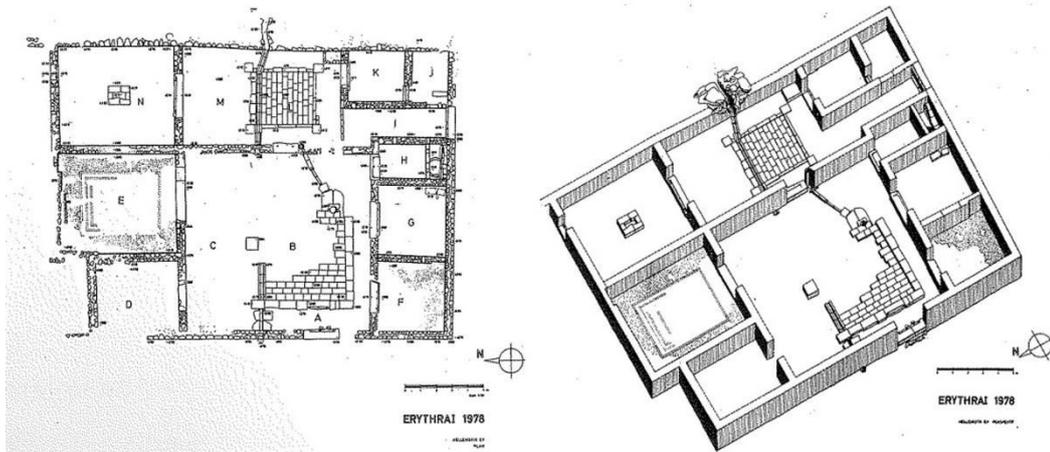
Plan of the Hellenistic Villa on the left and restored isometric plan on the right (Akurgal, 1979, p. 18-19)
